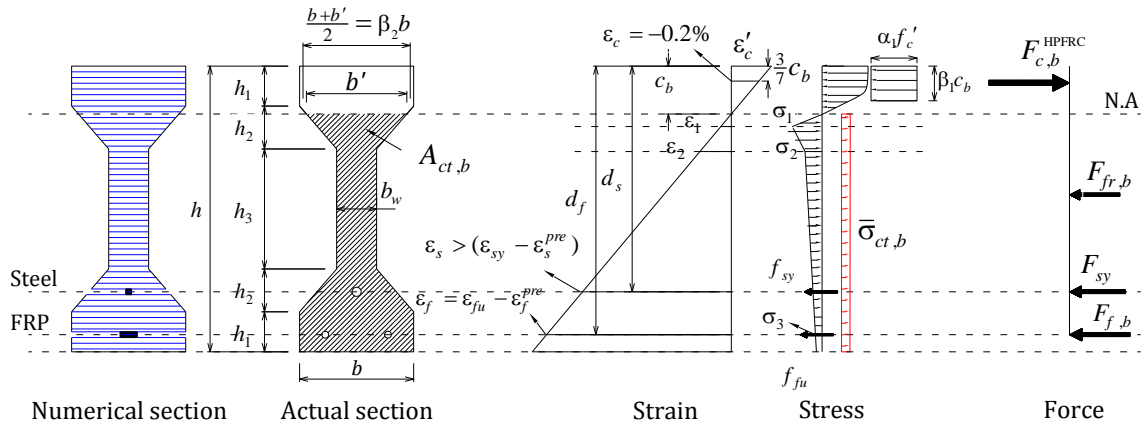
Balanced section of HPFRC beam reinforced by hybrid prestressed steel and FRP bars (not to scale)
